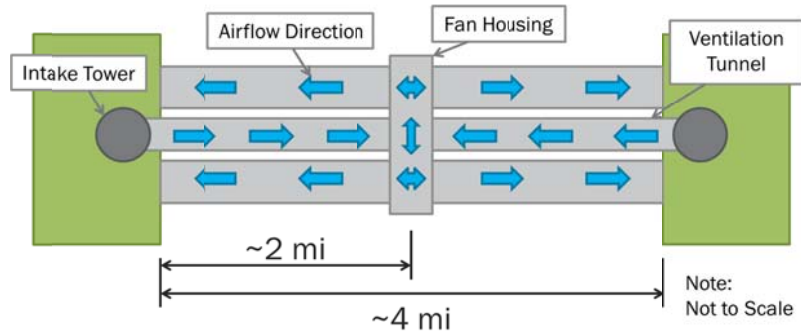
New Airflow Pattern With Separate Ventilation Tunnel
